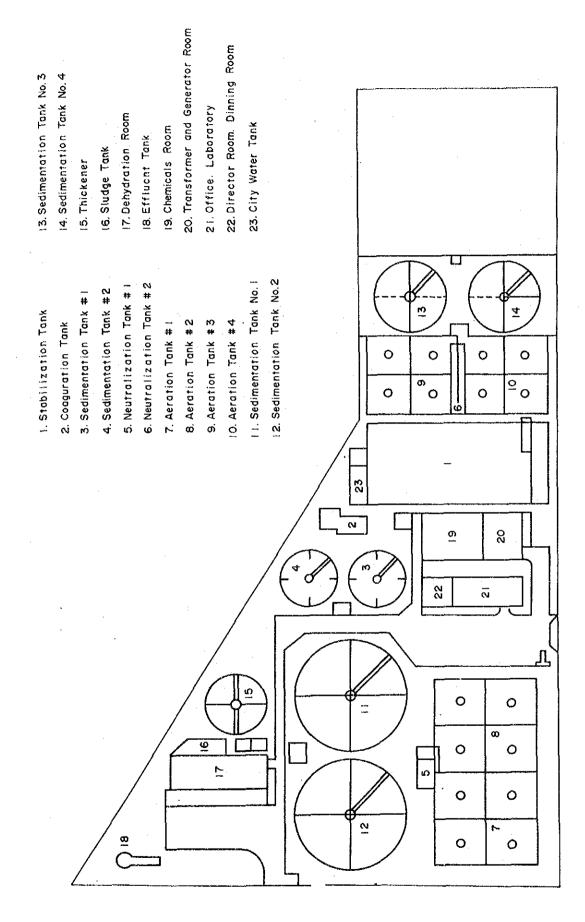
Layout of Central Waste Water Treatment Plant
